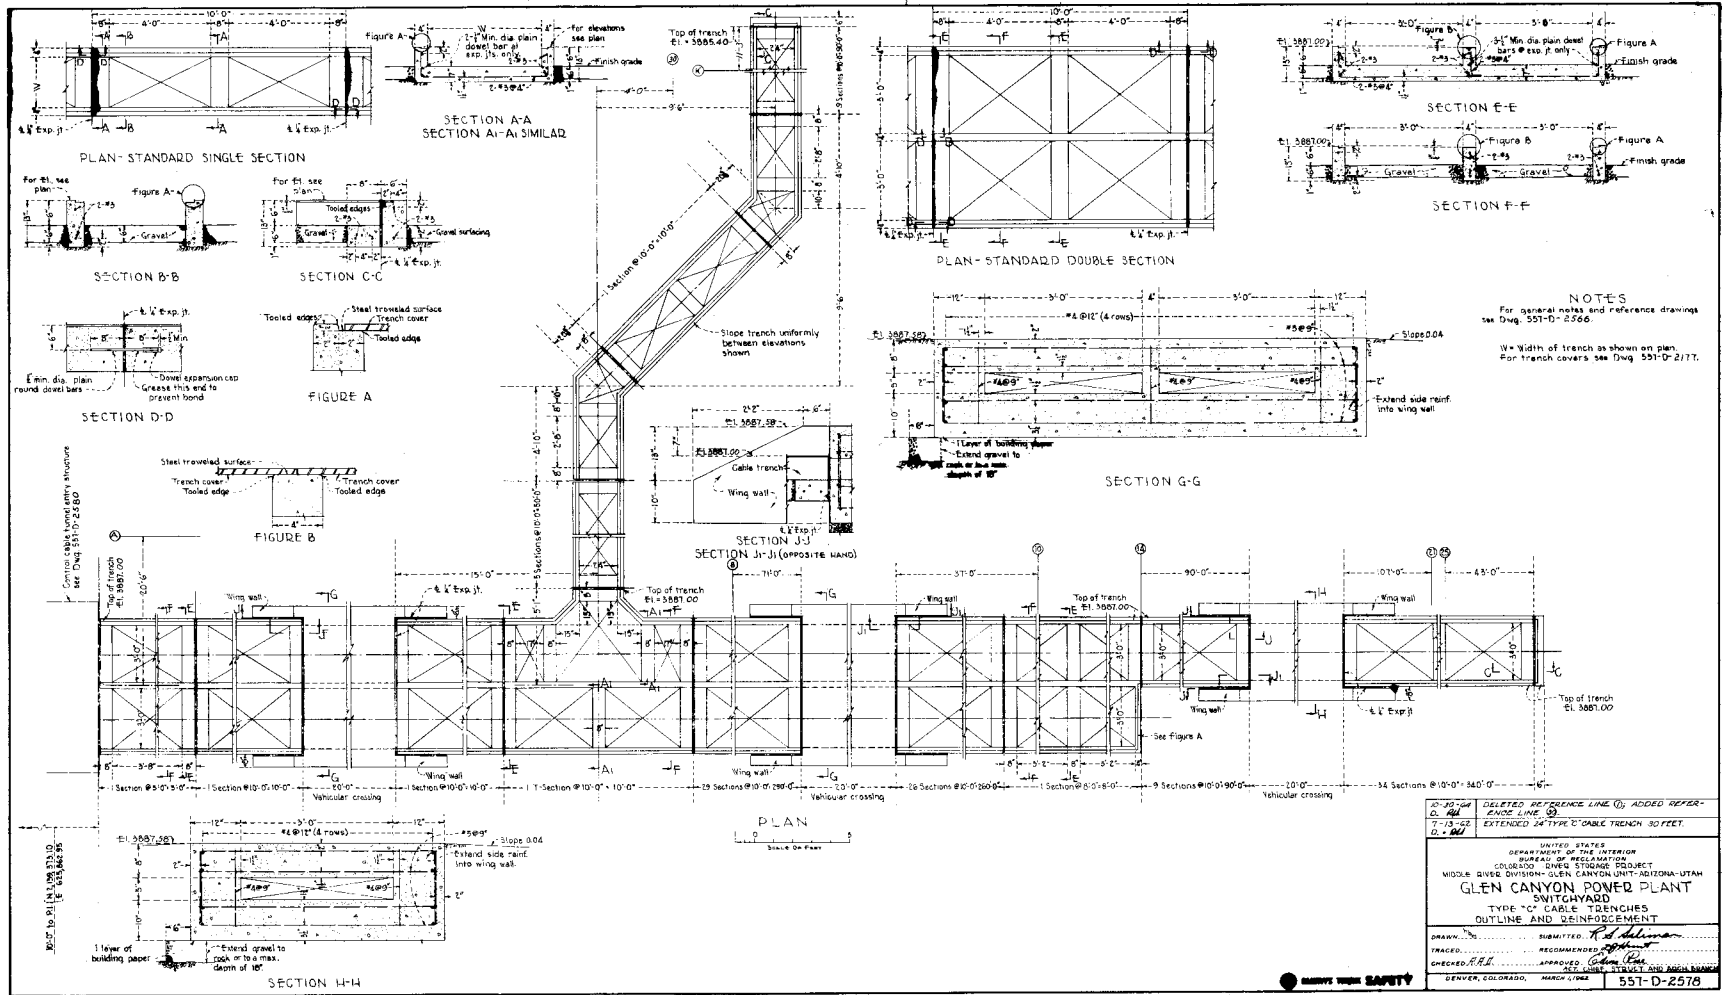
Switchyard Type C cable trenches—Outline and reinforcement.
